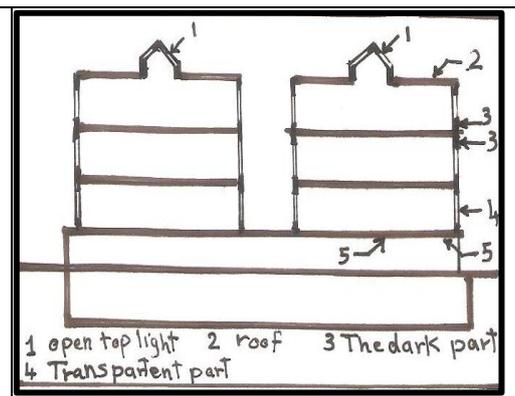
An explanatory section of the exterior casing elements of the building (Source: 16)
